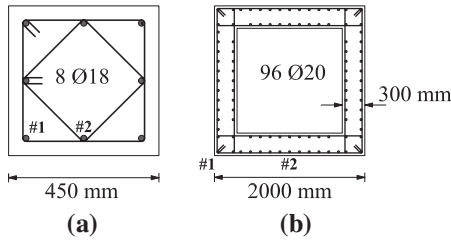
Geometry and reinforcement layout of square RC cross-sections: (a) solid cross-section; (b) hollow-core cross-section.
